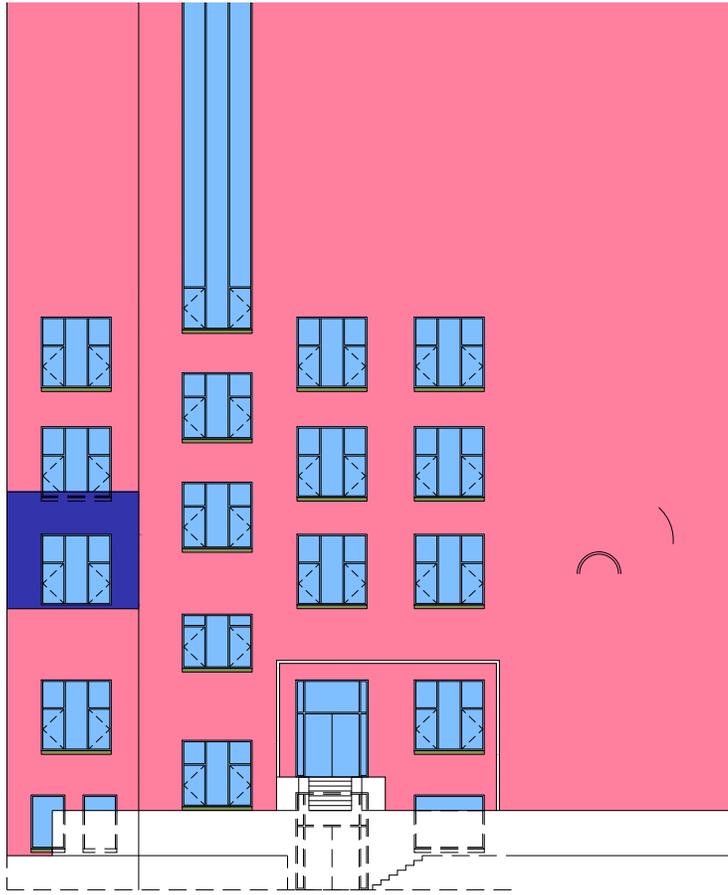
(5): North Courtyard: North-Facing Wall
